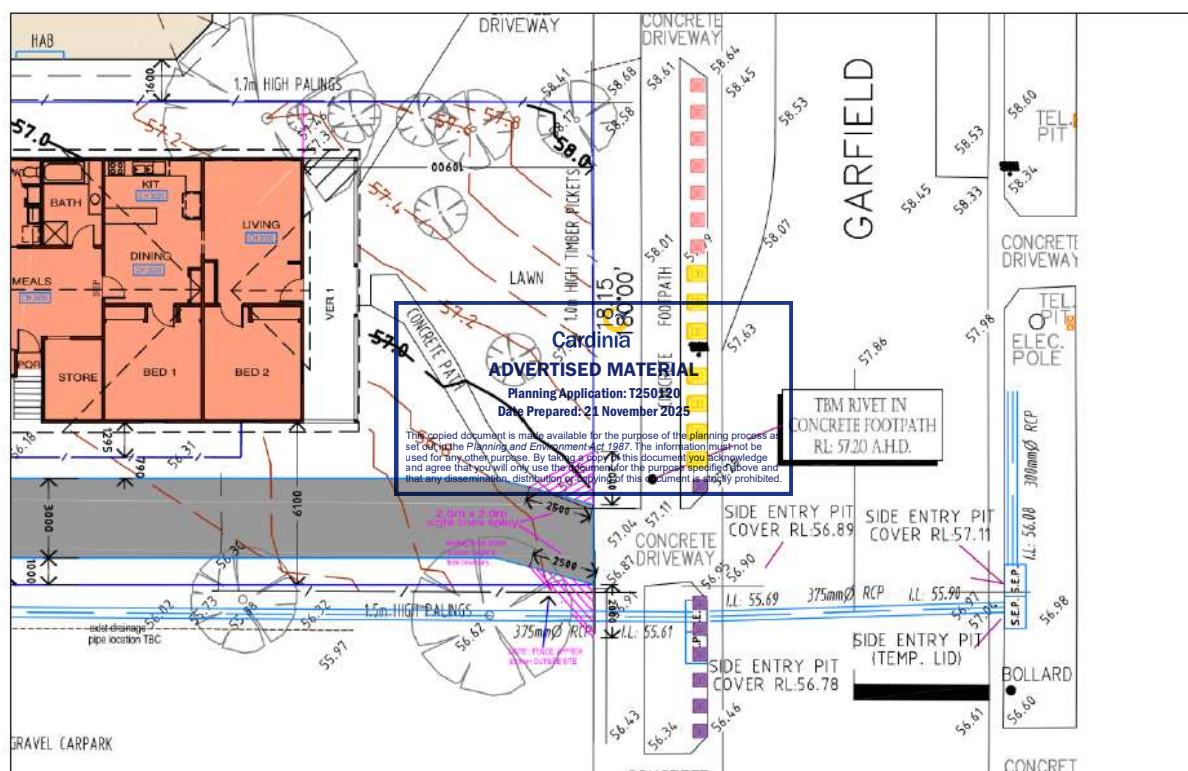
Insert from enclosed Waste Management Plan noting bin presentation plan
